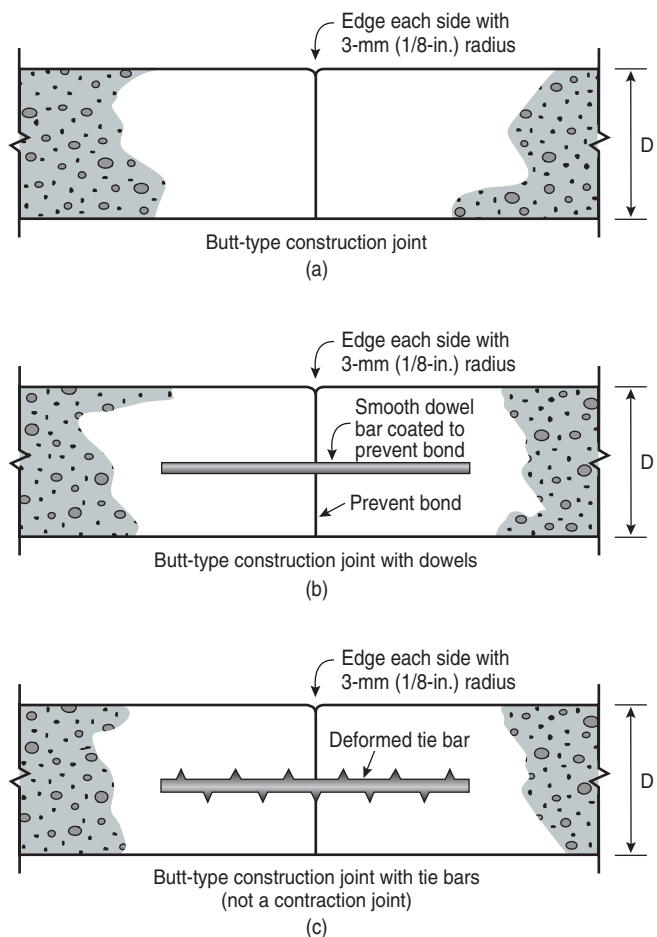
Construction joints are stopping places in the process of construction. Construction-joint types (a) and (b) are also used as contraction joints.
